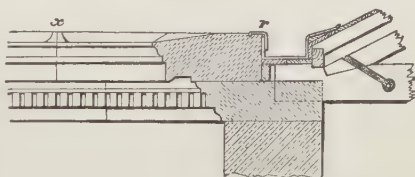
Stone Cornice. Sectional Elevation showing Saddled Joint at x.
